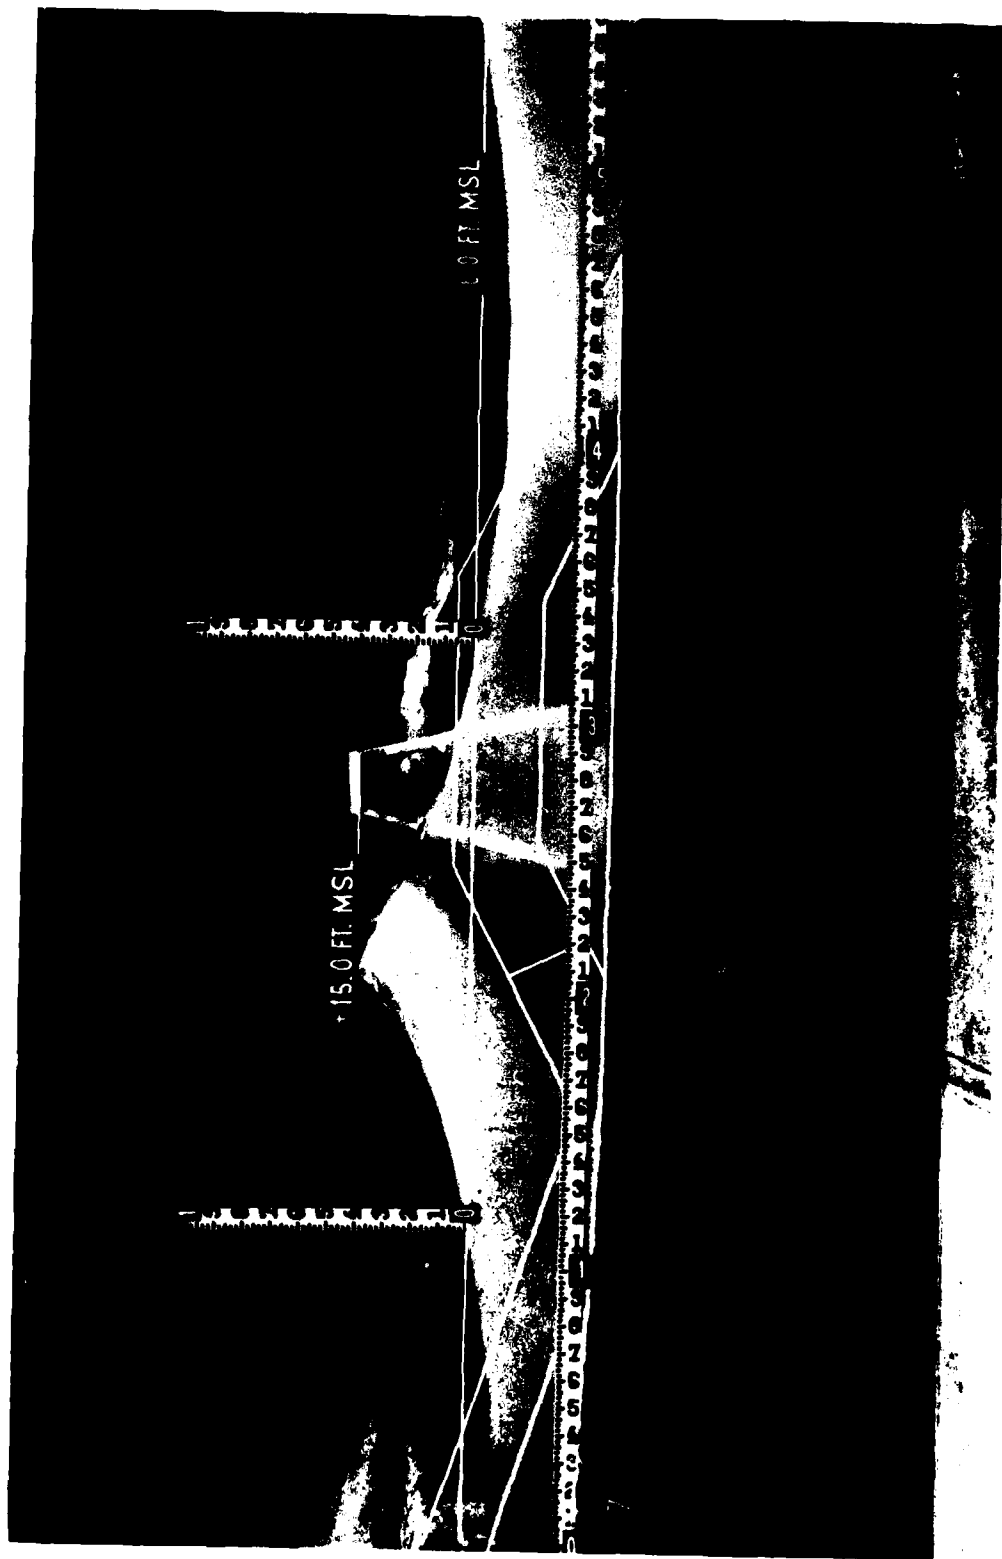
Side view of Plan N-3-A with trestle on north slope, 7.0-sec, 10.0-ft wave at +1.9 swl
